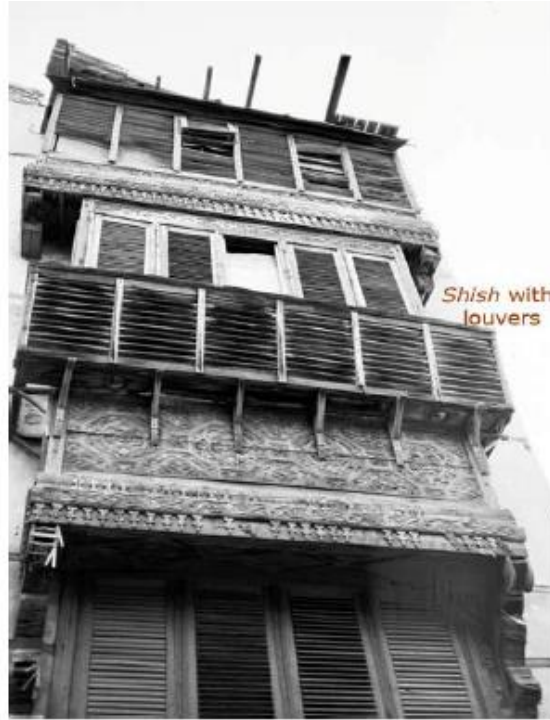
Louvers on a traditional facade (AL Murahhem, 2008)
